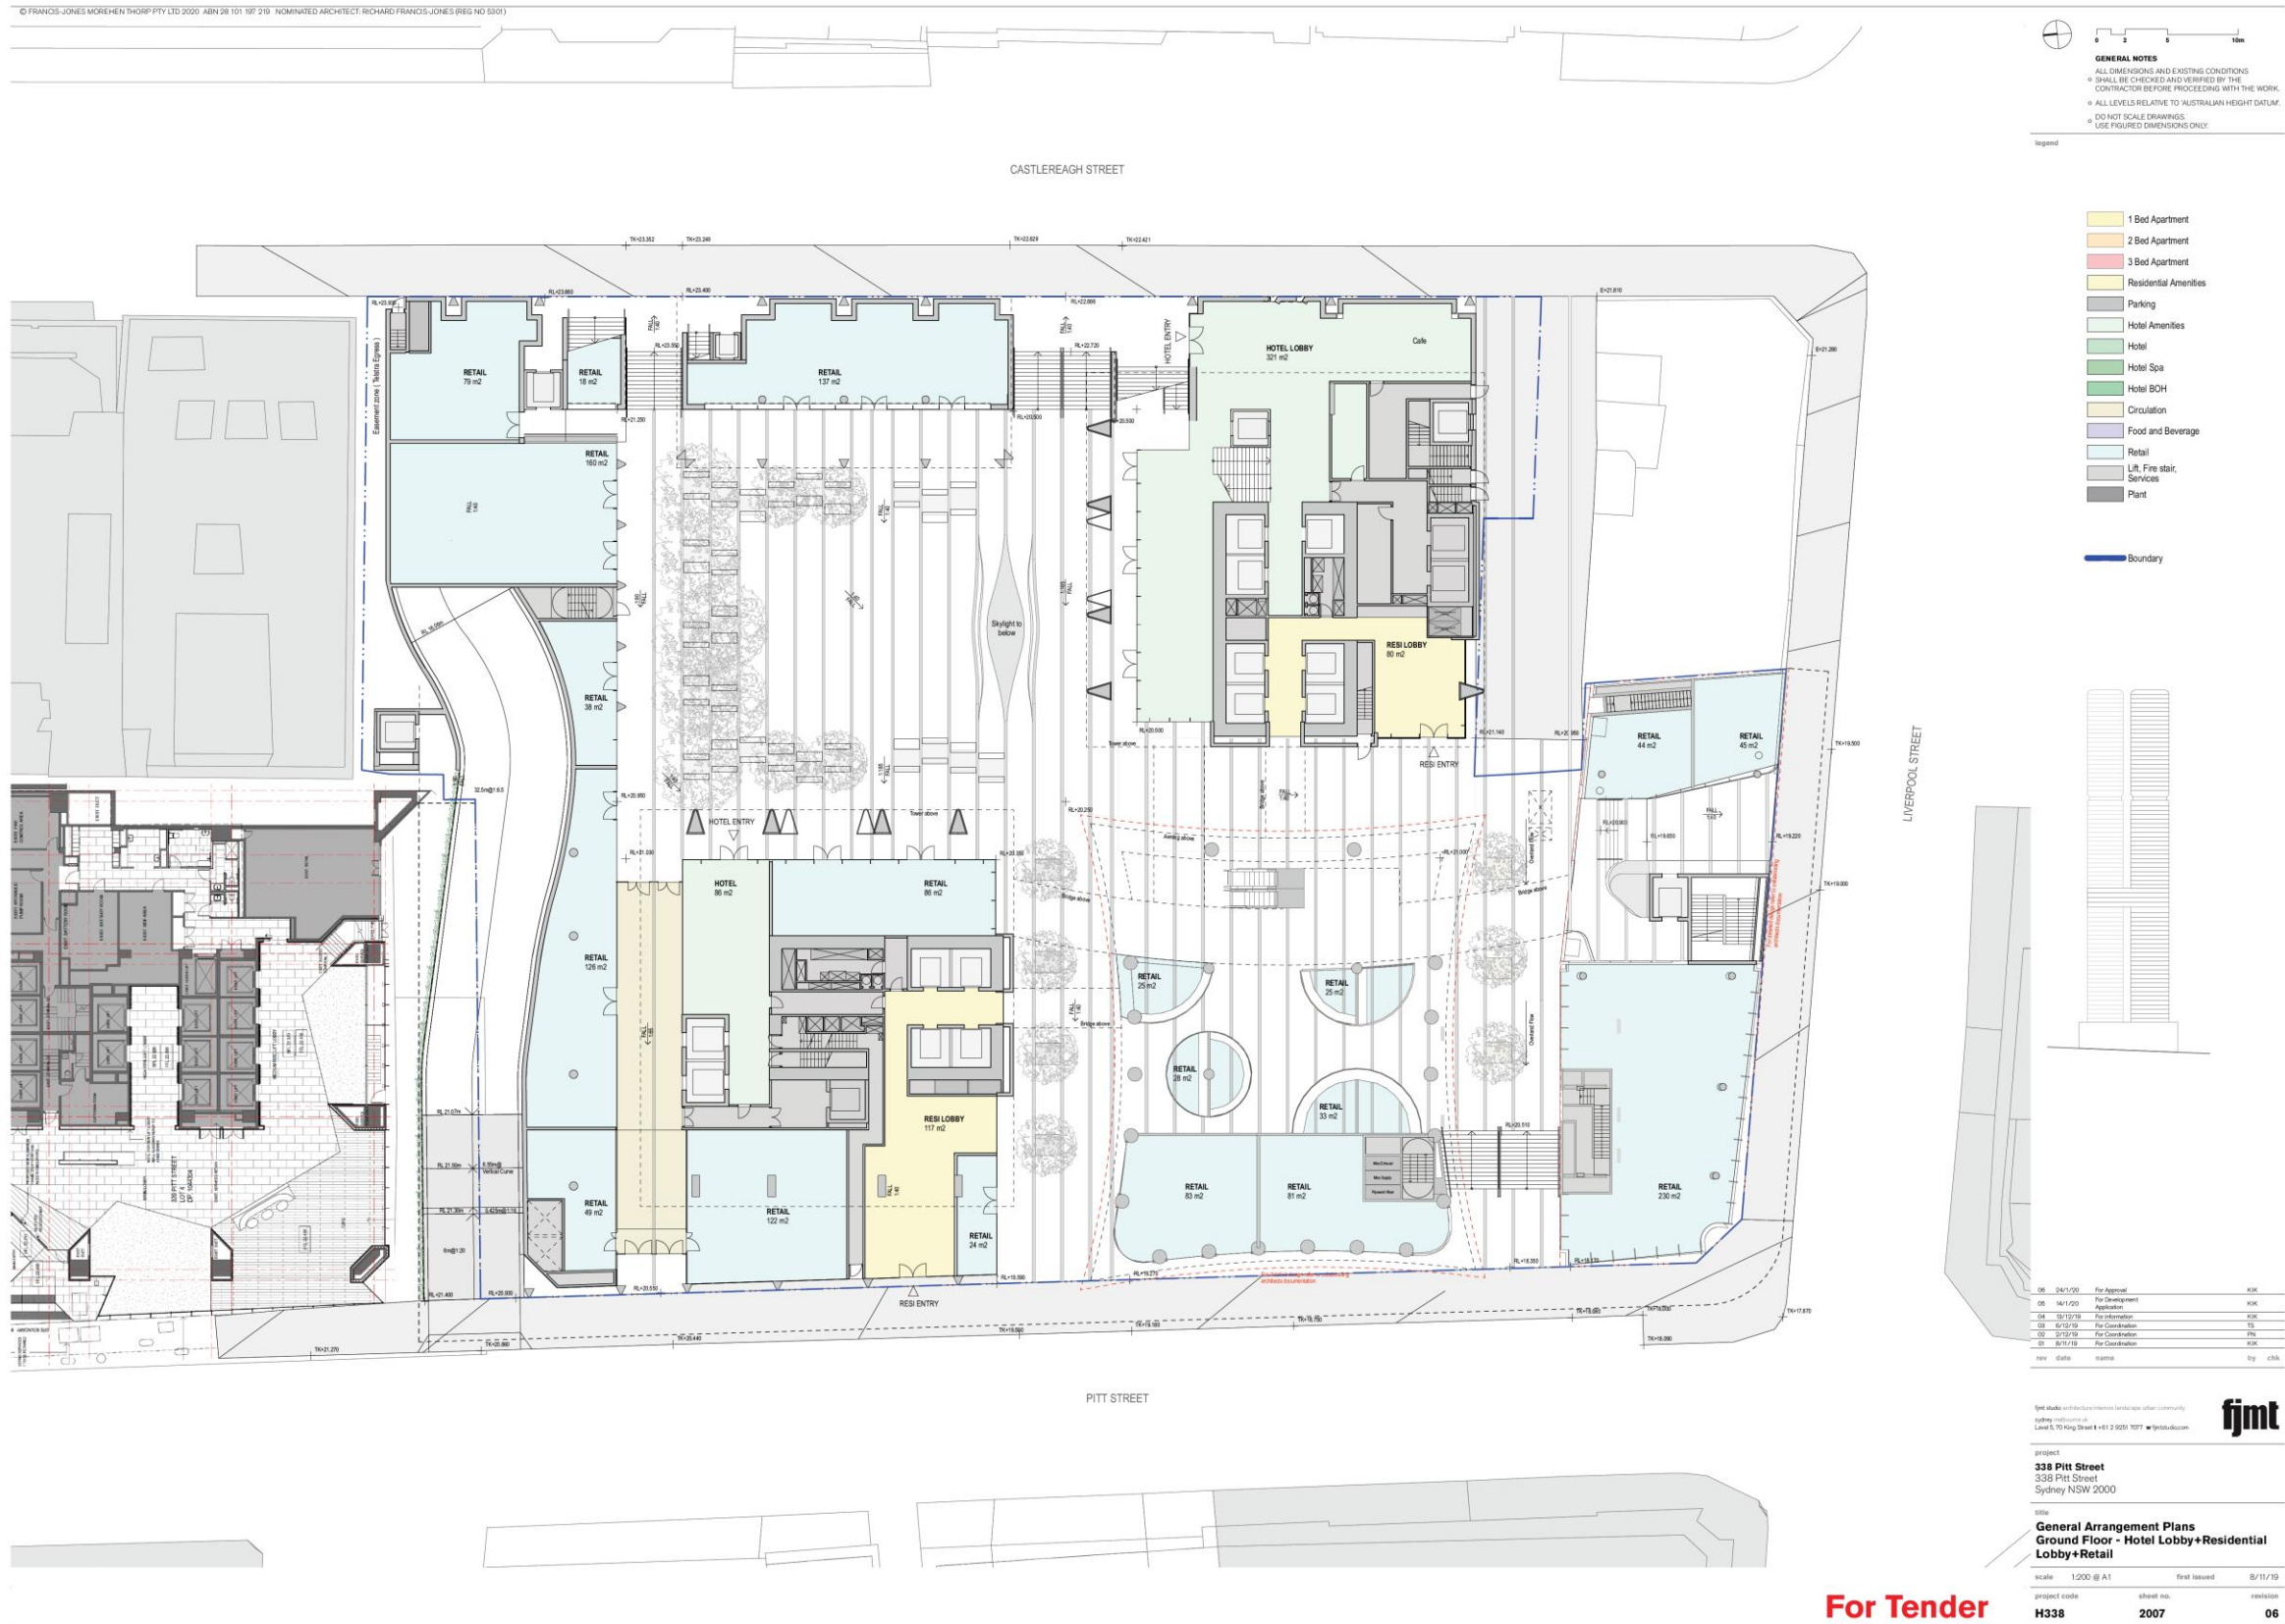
Ground Floor - Hotel Lobby, Residential Lobby, & Retail.
